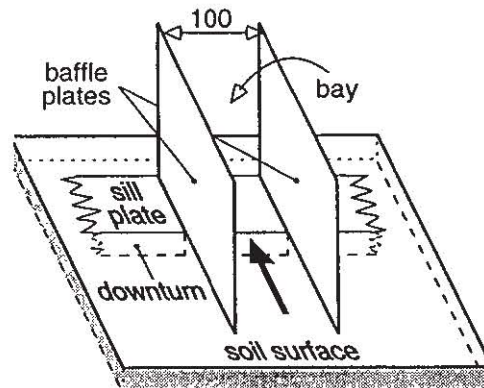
Detail of a bay showing baffle and sill plates forming a three-sided sluice at exit. (Dimensions in mm.)
